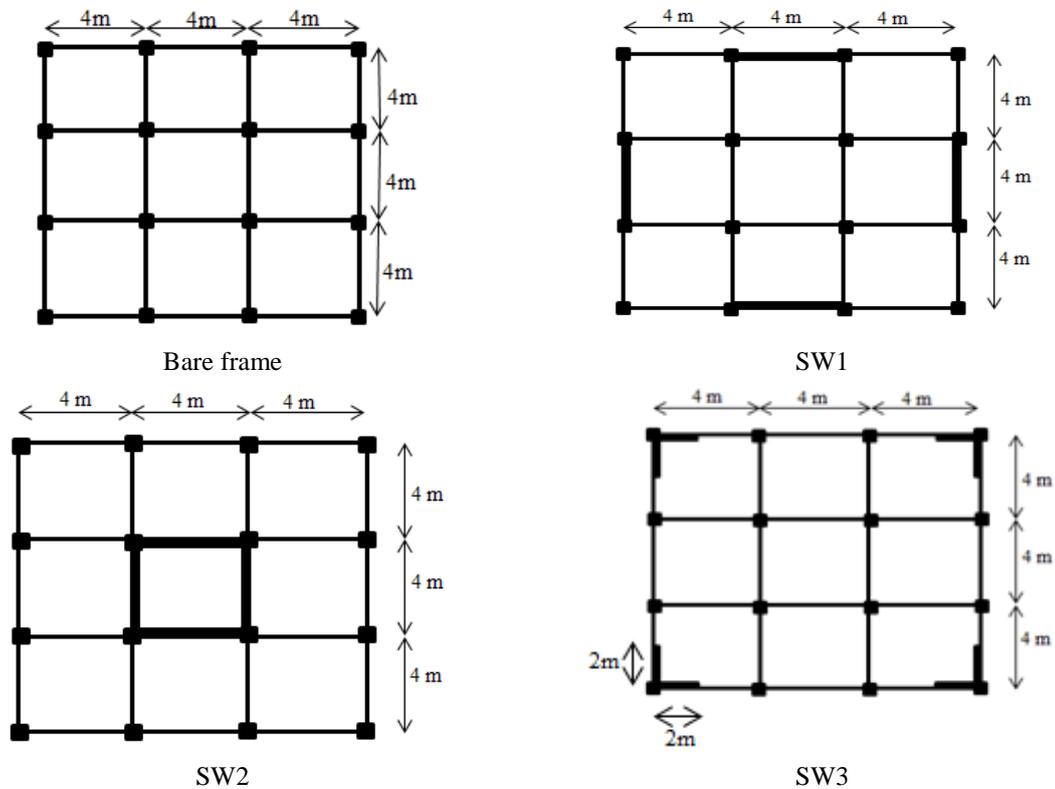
Plan of bare frame and frames with various locations of shear wall
